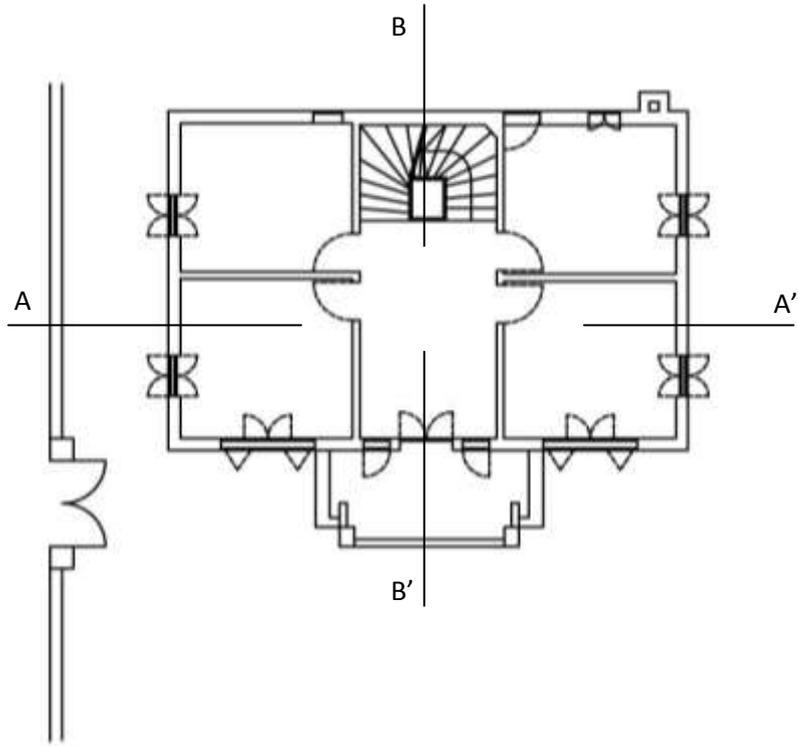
Ground (entrance) floor of the house at 135 lot 30 parcel
